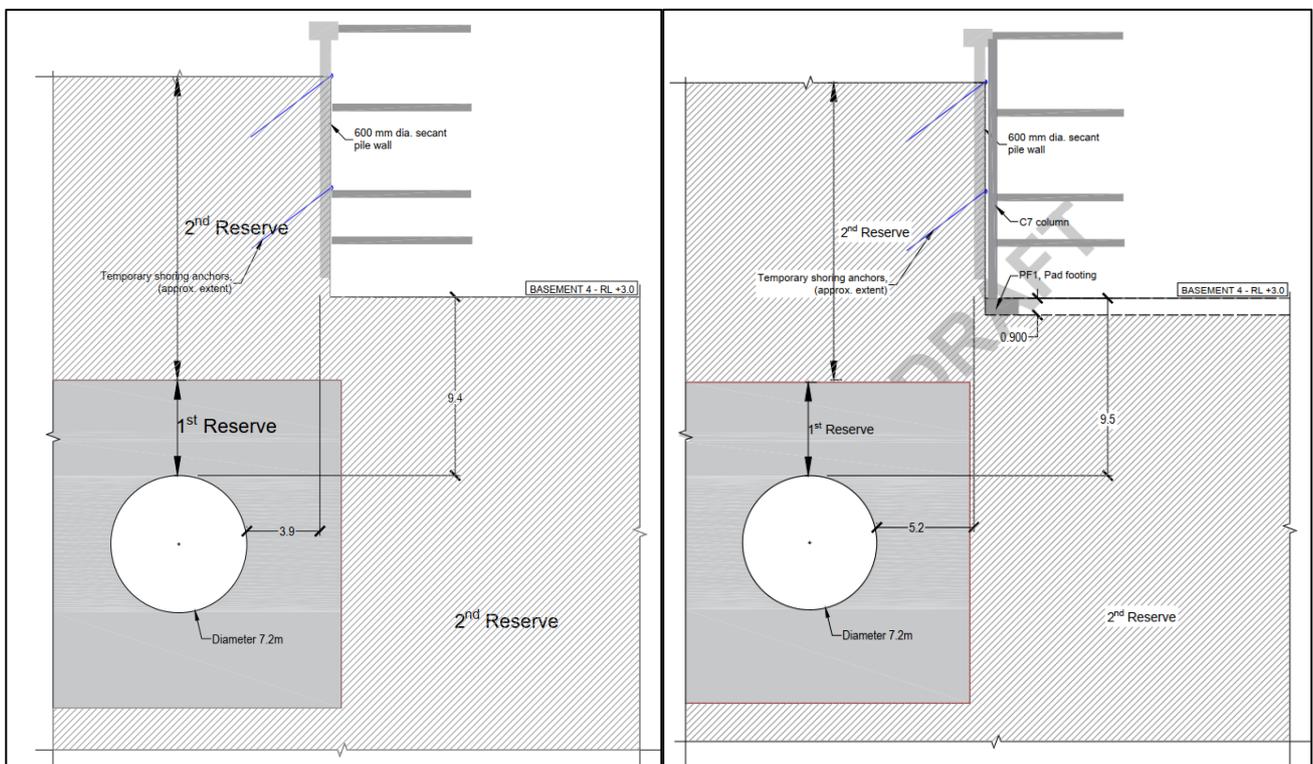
Cross section A-A and B-B from Figure 6-3 (source: project rail interface report [2])
